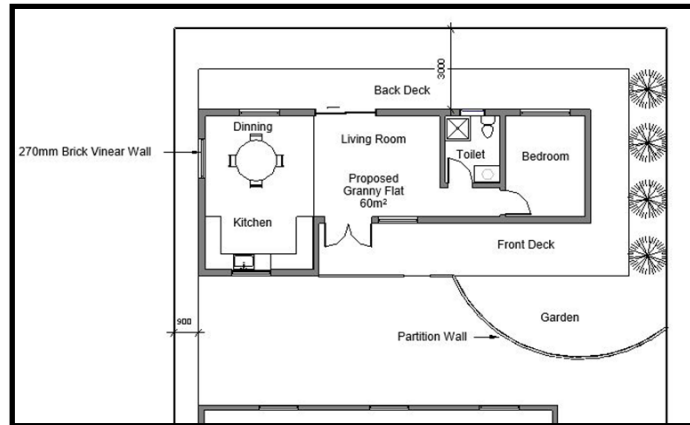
New Proposed Granny Flat Floor Plan Design (self designed)
